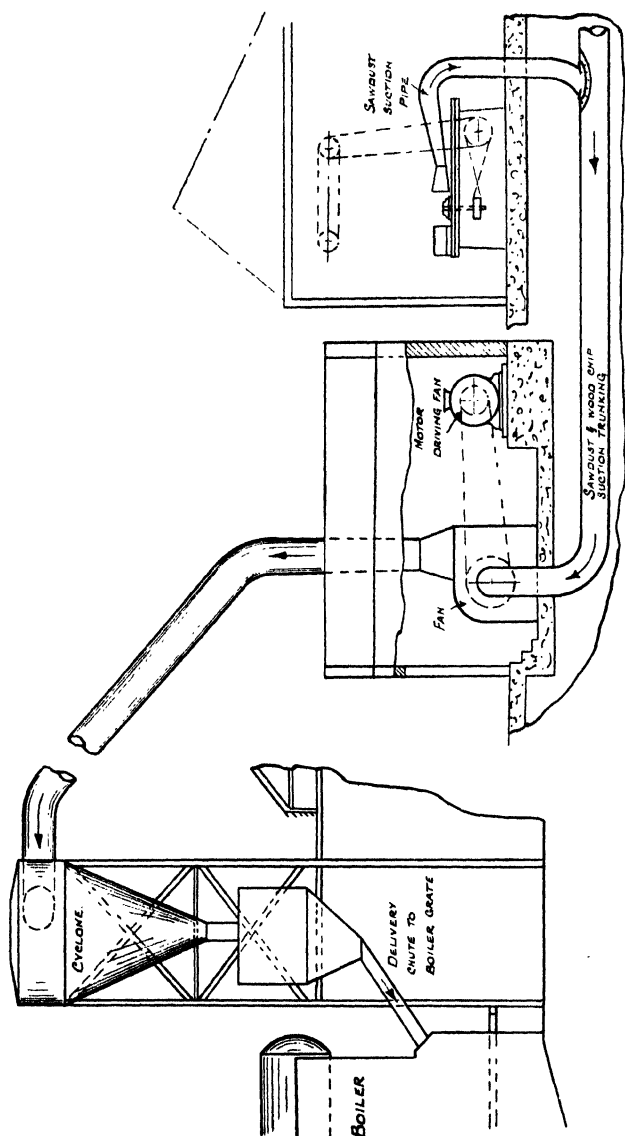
SYSTEM FOR REMOVING SAWDUST AND CHIPS FROM WOODWORKING MACHINES TO BOILER AND GRATE
